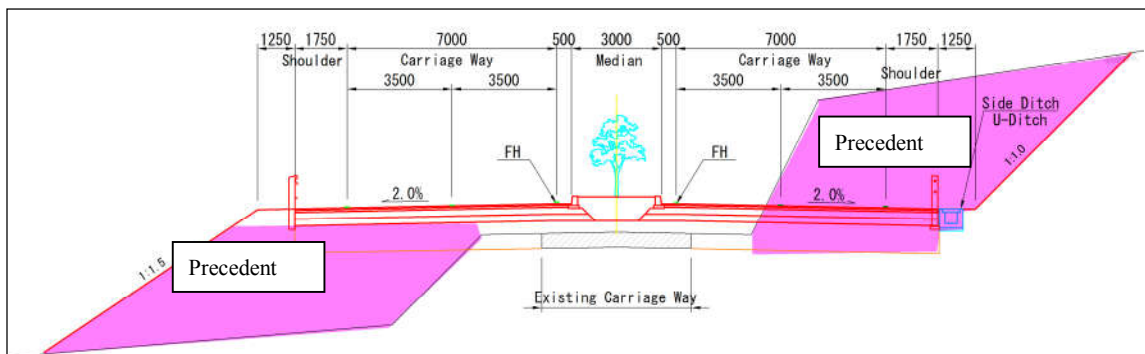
Secure of existing traffic in case of not constructing service roads
